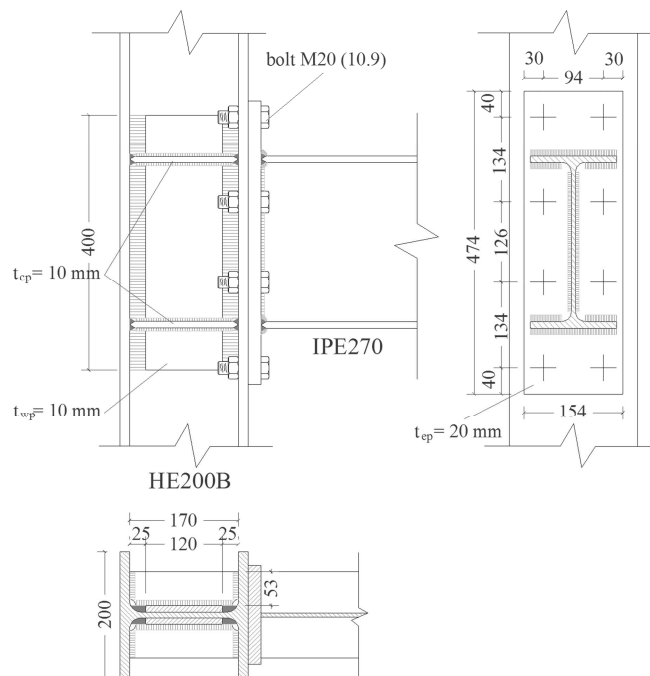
Geometry of EEP-CYC 02 specimen
